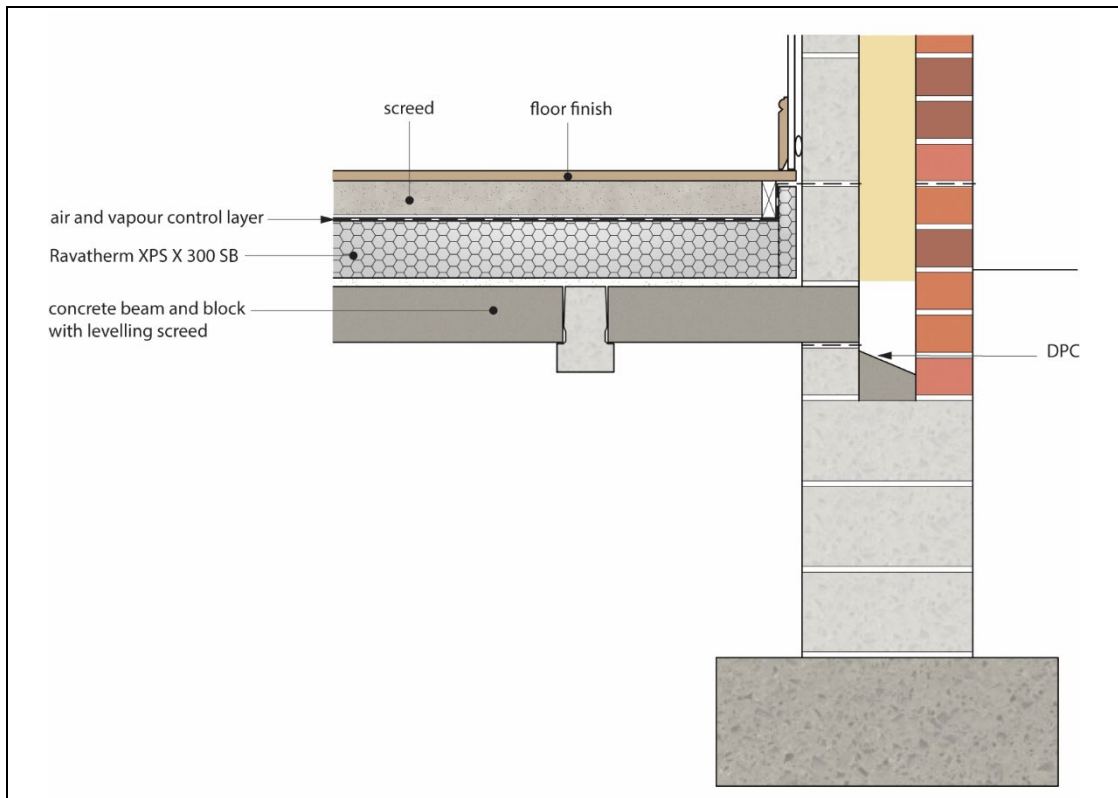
Ravatherm XPS X 300 SB Floor Insulation above suspended beam-and-block concrete floor
